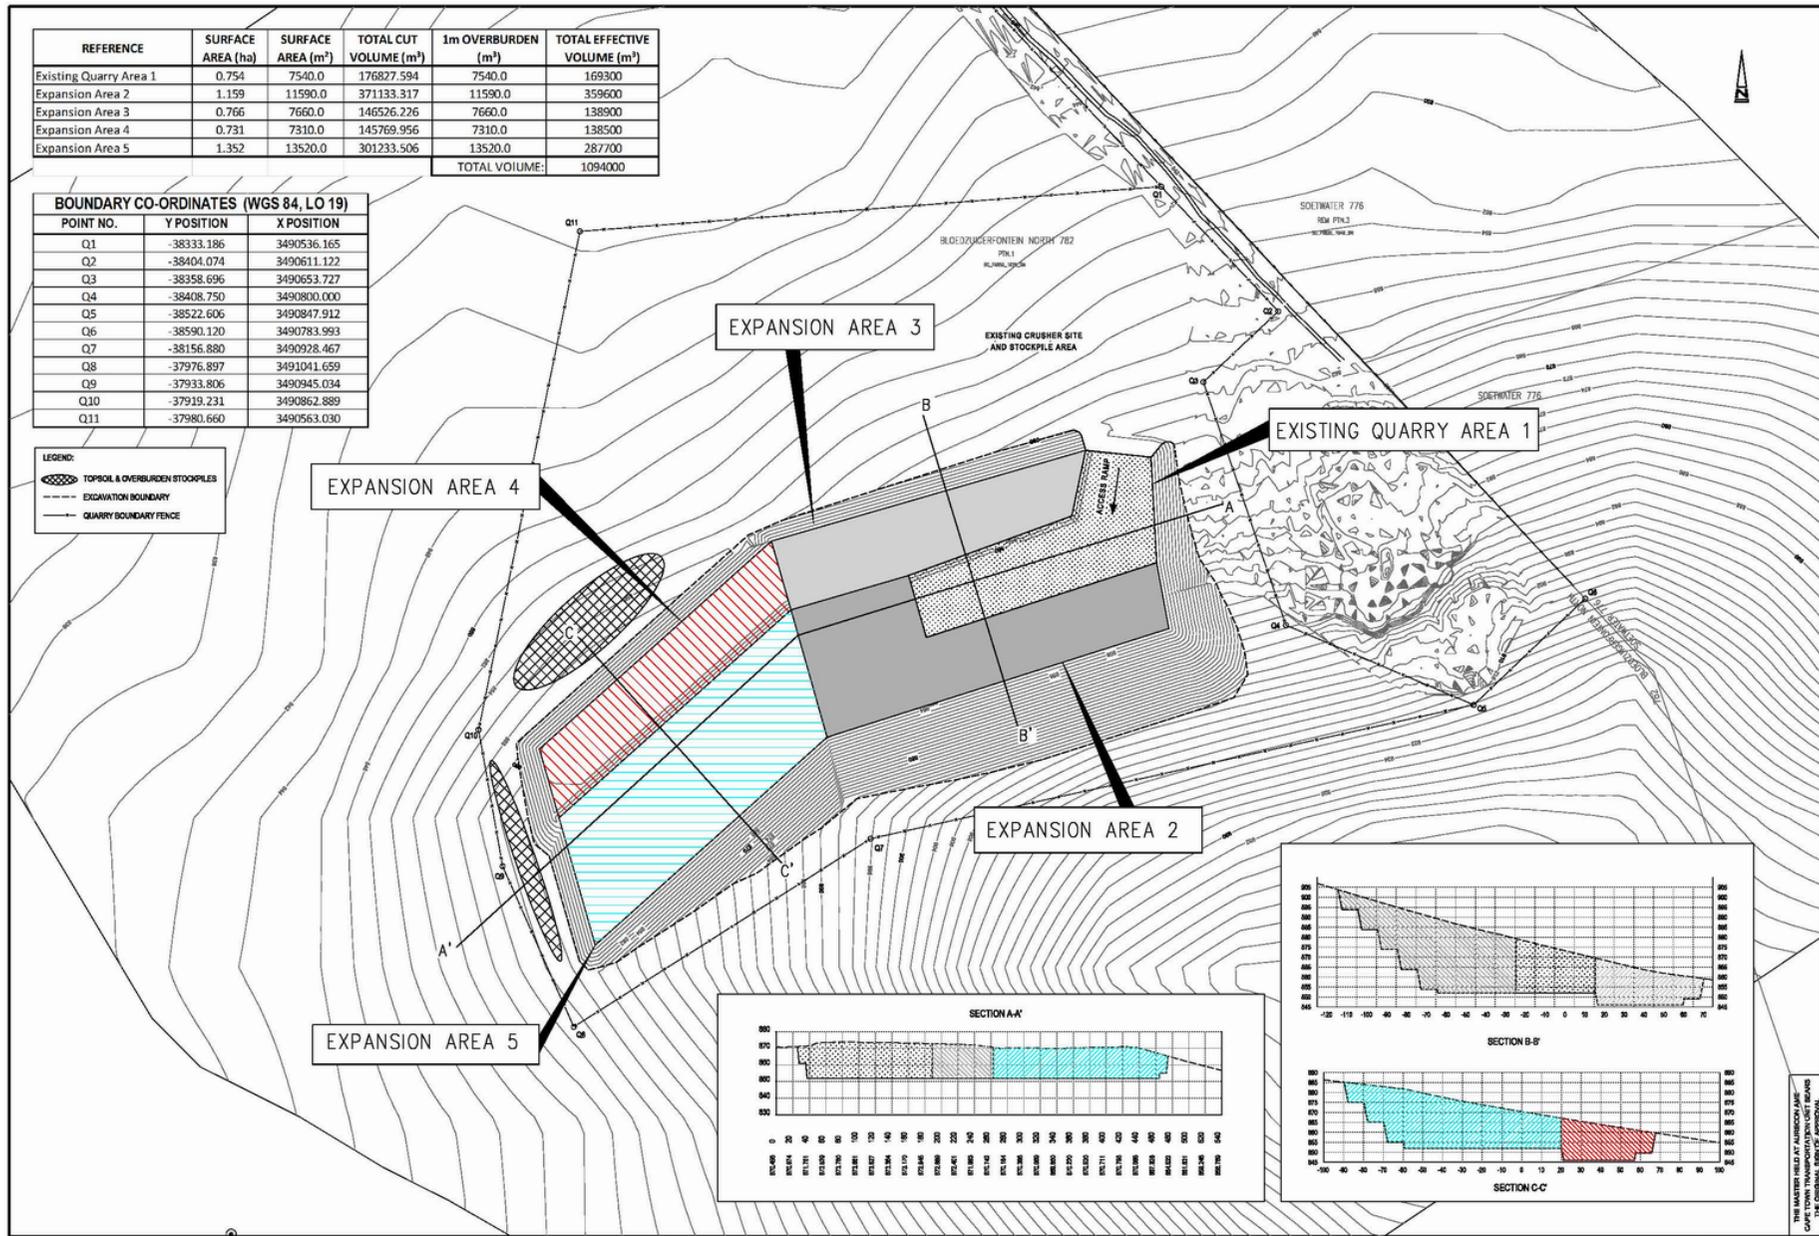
Lay-out plan of the proposed expansion area for Borrowpit BP R27-8 KM 32.6 RHS 6.2 (not to scale)
